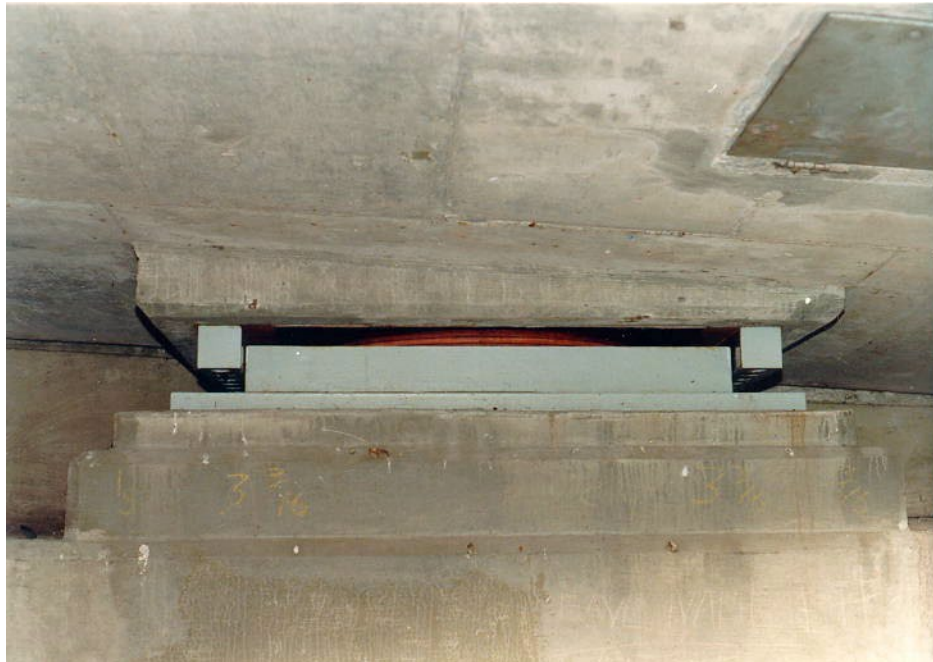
Pot Bearing with Side Guide Bars
